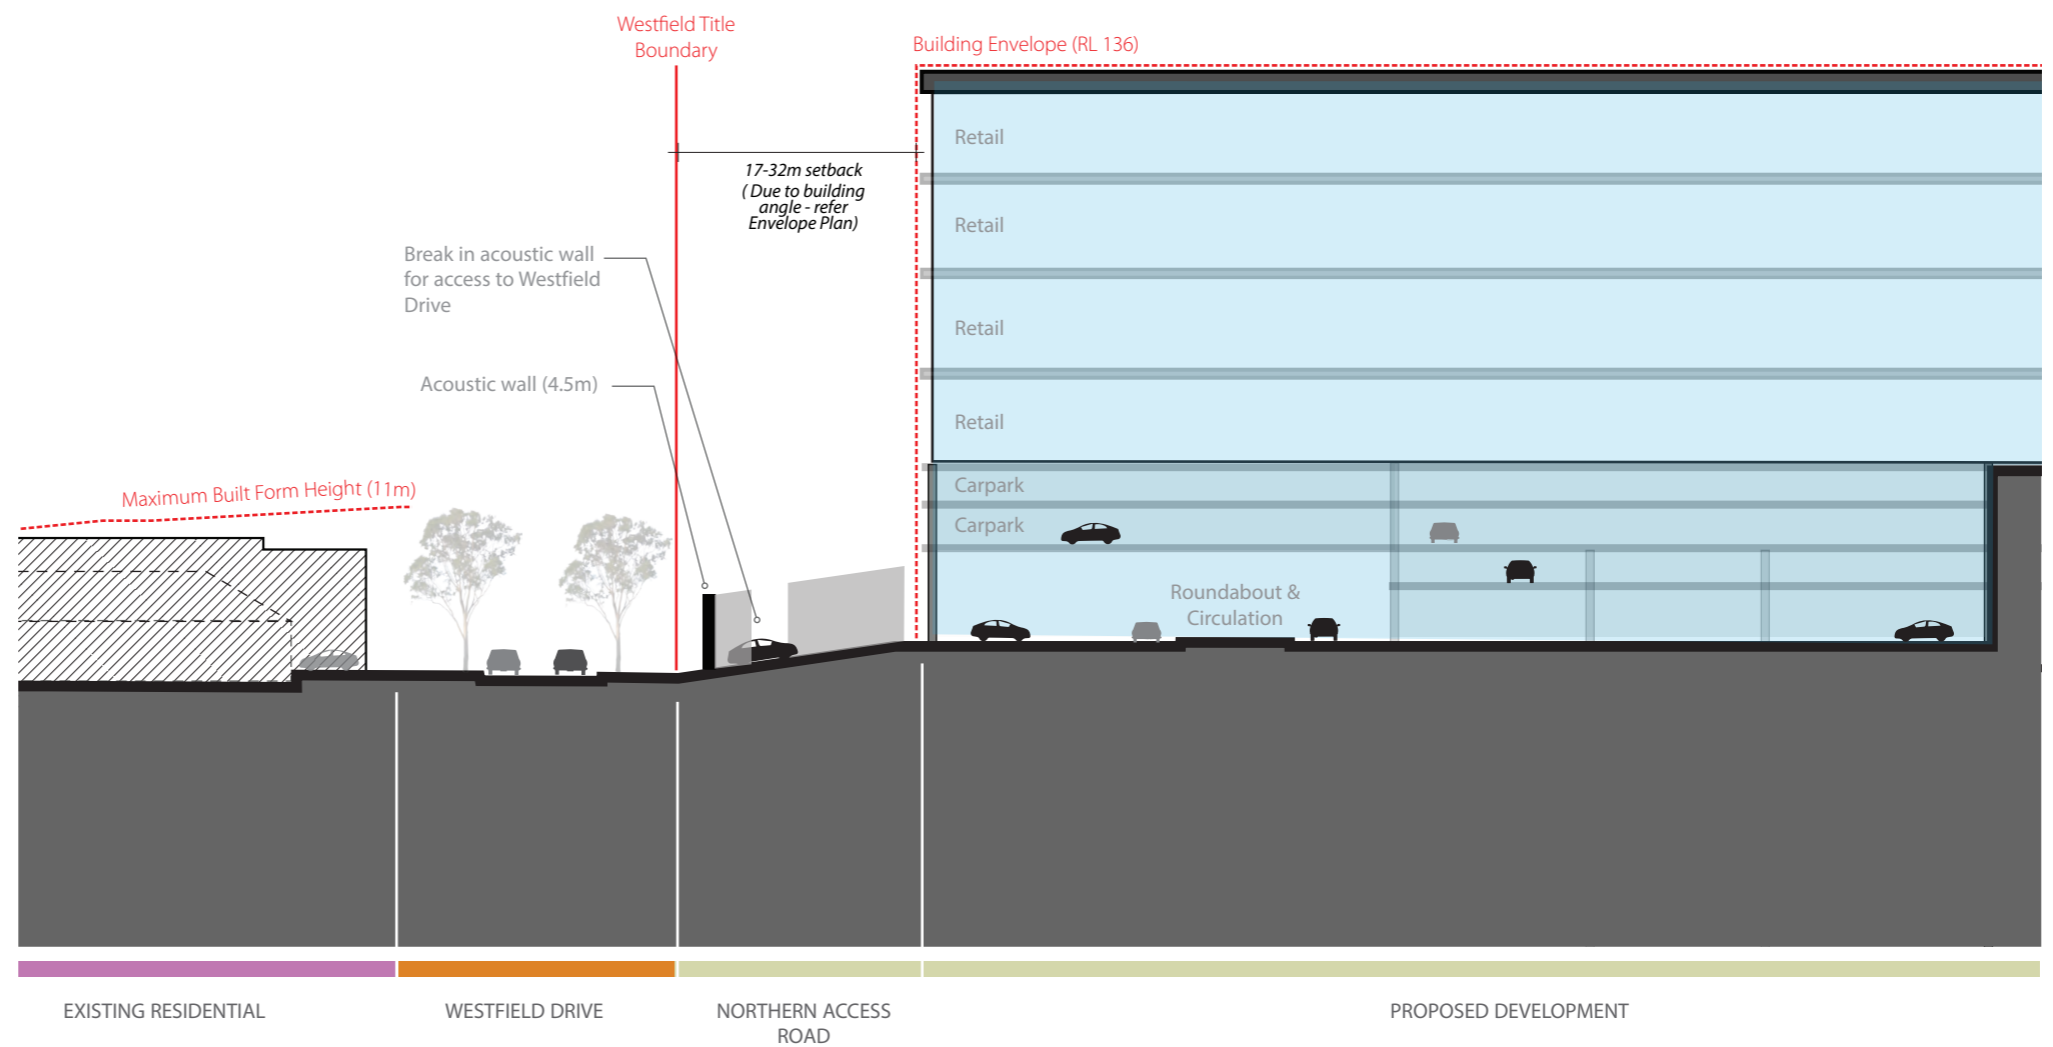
Section through proposed accessway showing interface with Westfield Drive (Floor levels are indicative only)
